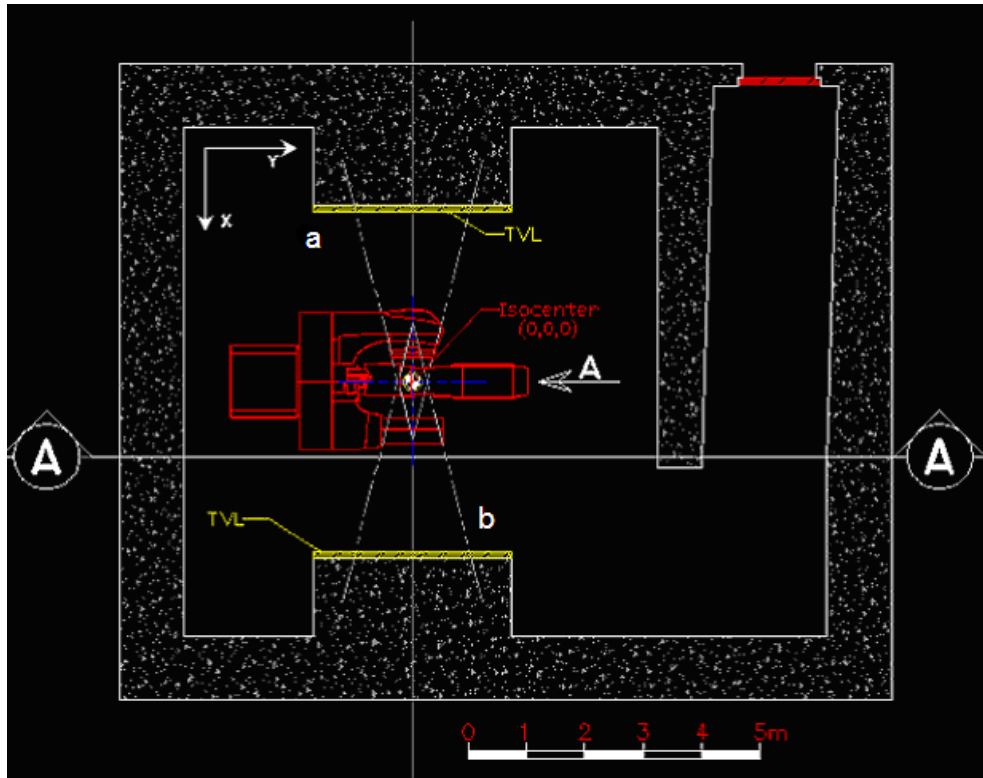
Plan view of the radiotherapy room, with placement of shielding at walls (a and b).
